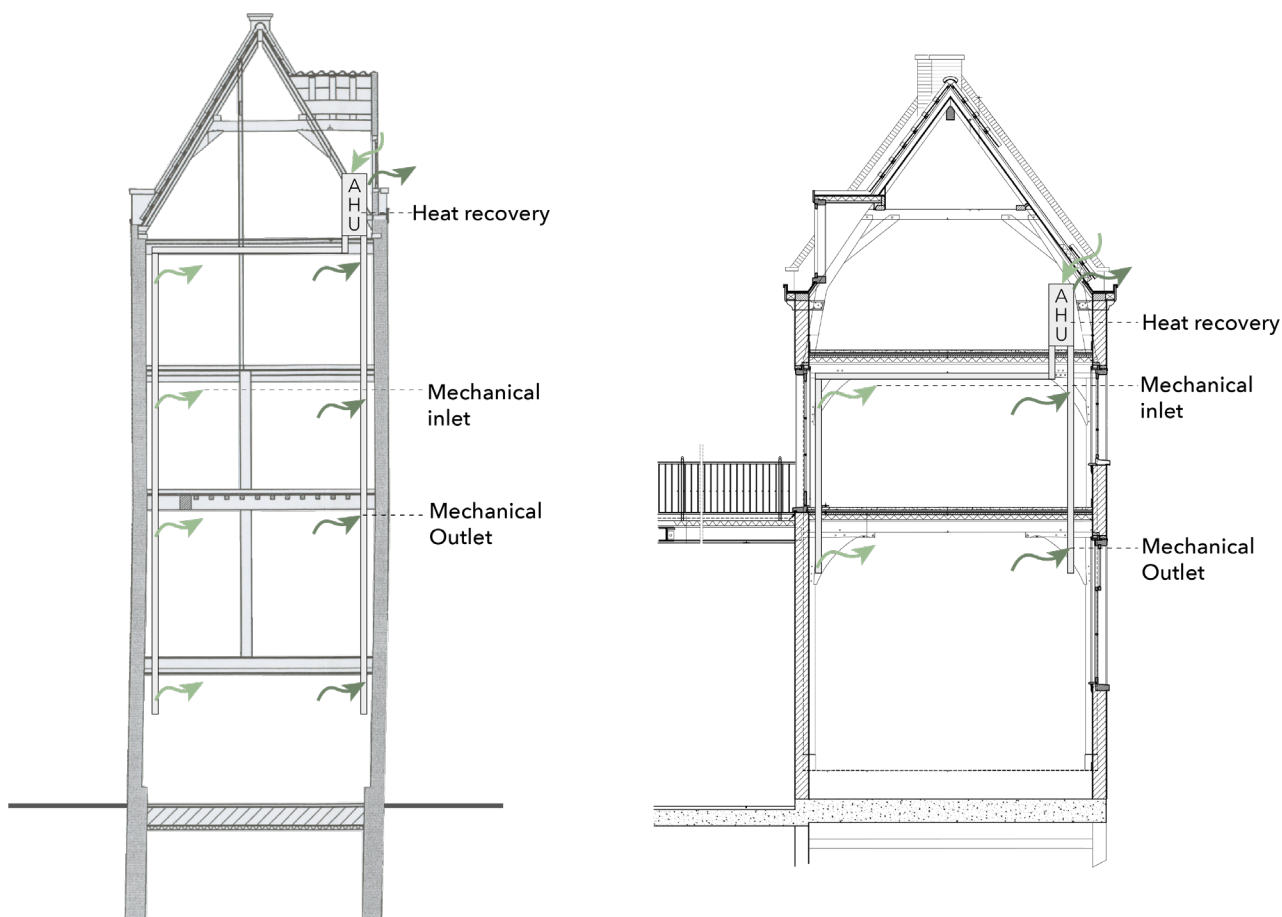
Proposed ventilation design front house & back house. Adapted from Stadsherstel, 2005.
